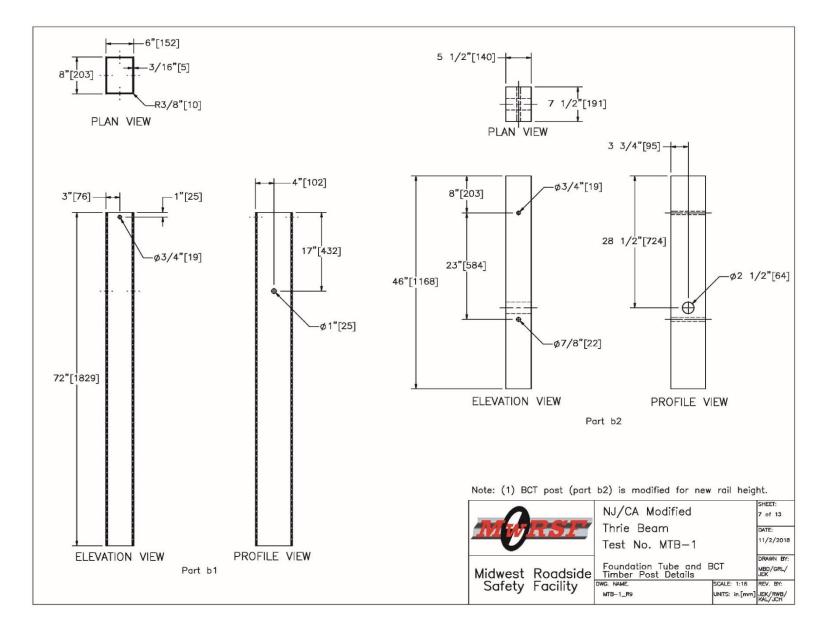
Foundation Tube and BCT Timber Post Details, Test No. MTB-1
